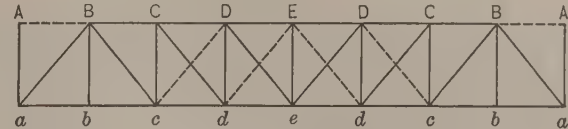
(c). Deck Pratt Truss. (See photograph, page 104.)
